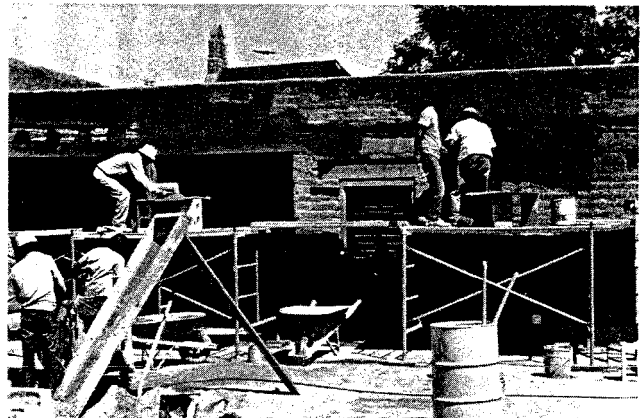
APPLICATION OF STUCCO WIRE OVER EXTERIOR OF ADOBE BRICKS AND ADDITION OF CEMENT COAT; final finish will be colored stucco.
